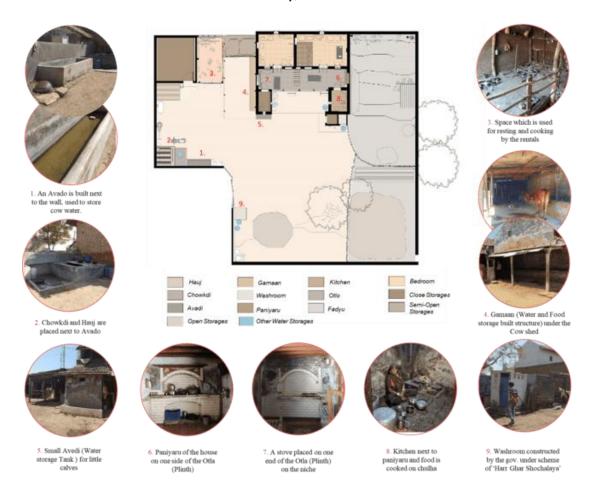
Bhadiyad House Plan and activities related to water spaces Source: Author
